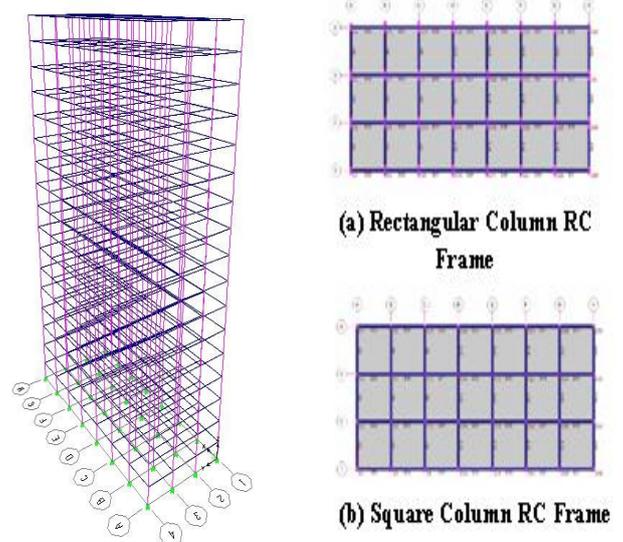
Typical Isometric and Plan View of G+15 Storey RC Frame
